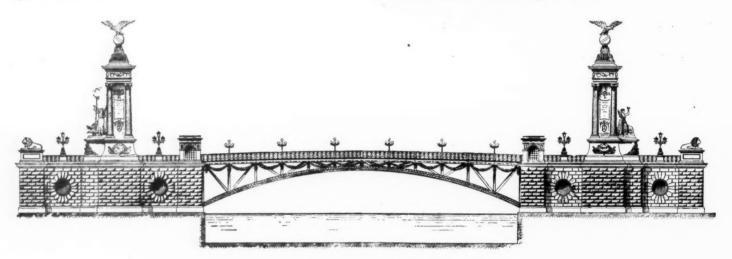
BOULEVARD SCHERZER ROLLING LIFT BRIDGE
